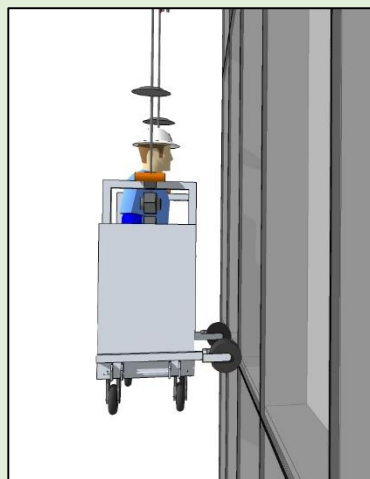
In its working position, the cradle or working platform should be as close as practicable to the face of the building
